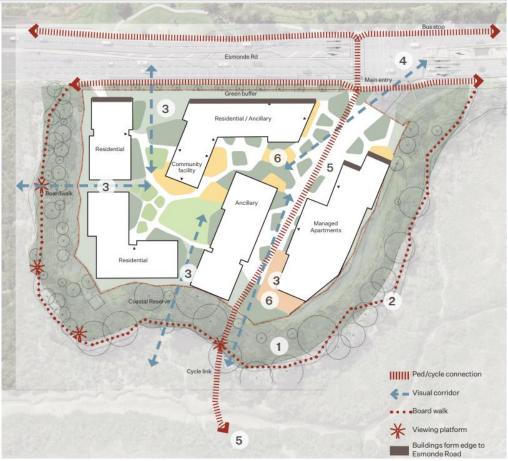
Proposed Masterplan for 48 Esmonde Road (Source: JASMAX)
